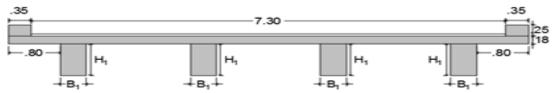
Diagram of the vehicular bridge deck supported on reinforced concrete beams.
